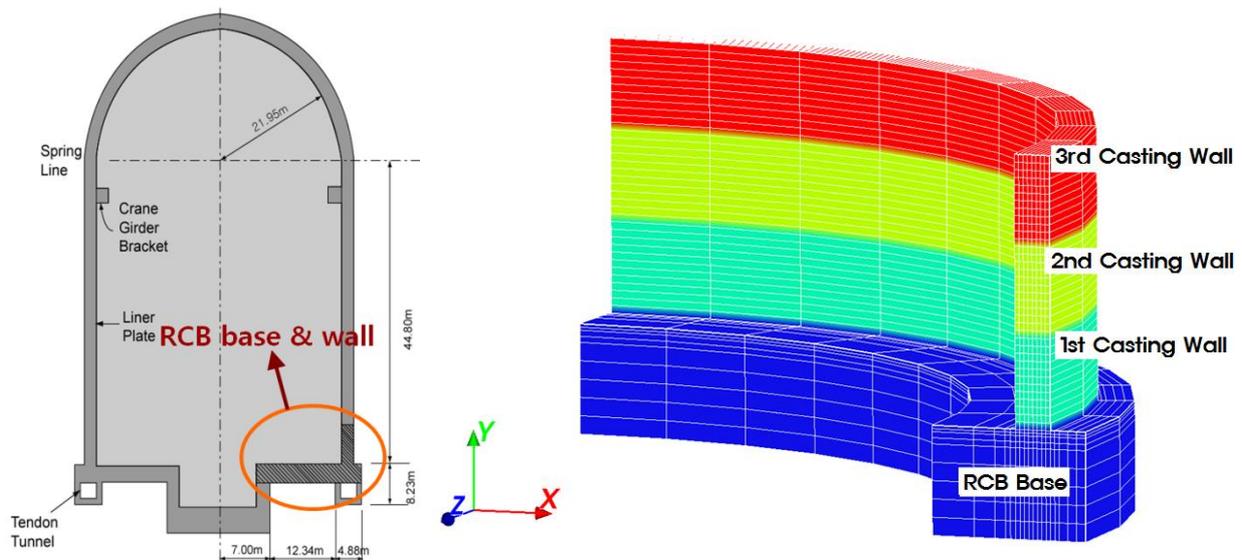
Mesh Modeling of RCB Base Mat and Containment Concrete Wall.
